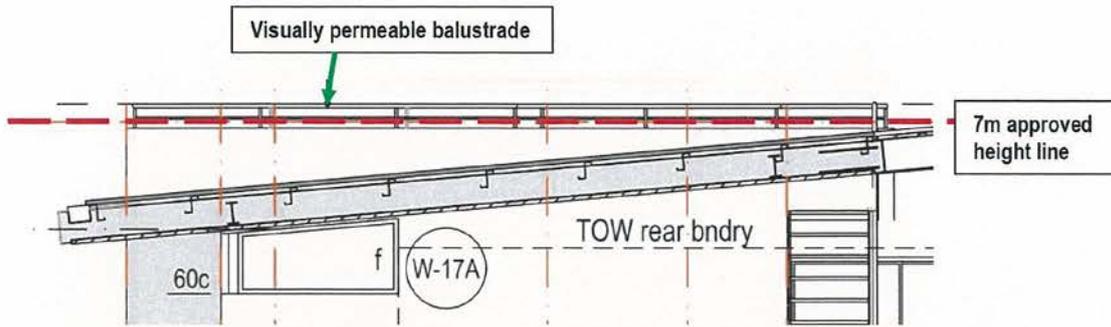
Excerpt of elevation showing portion of roof deck exceeding 7.0m height
